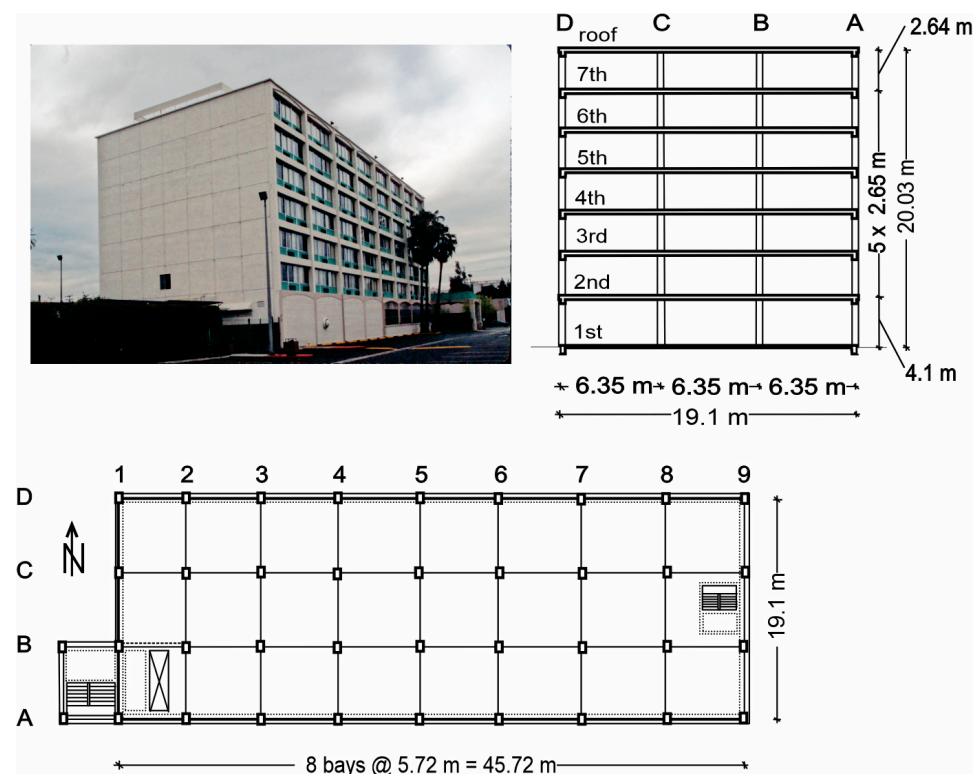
(Top left) Northeast view; (top right) typical transverse section; and (bottom) typical floor framing plan of the Van Nuys seven-story hotel (VN7SH).
